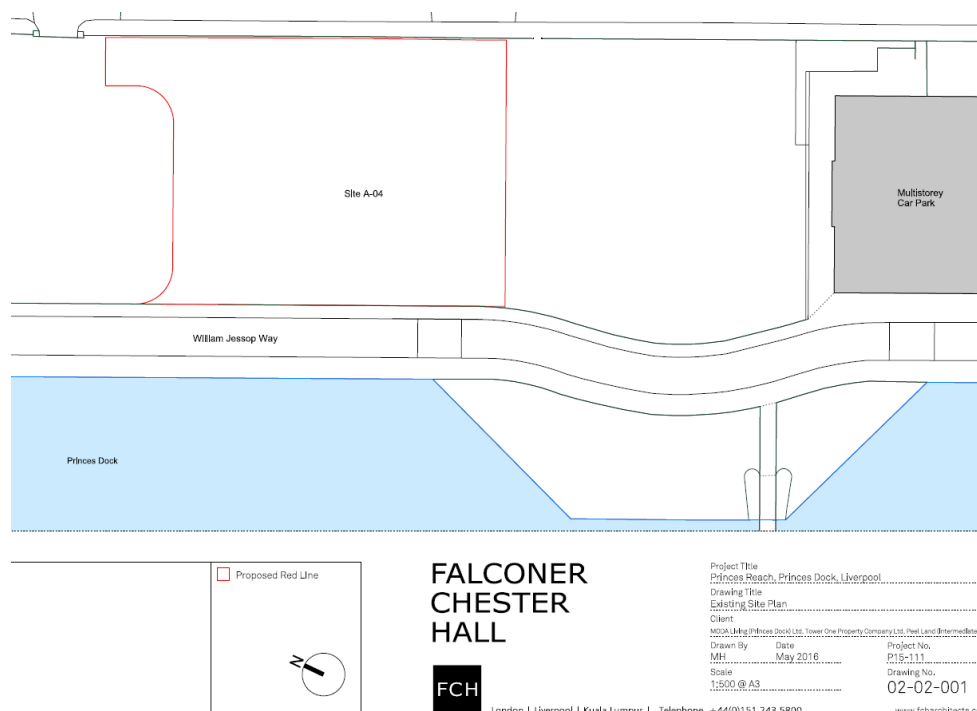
Extract from Site Location Plan detailing the development boundary (1:500 @ A3)
